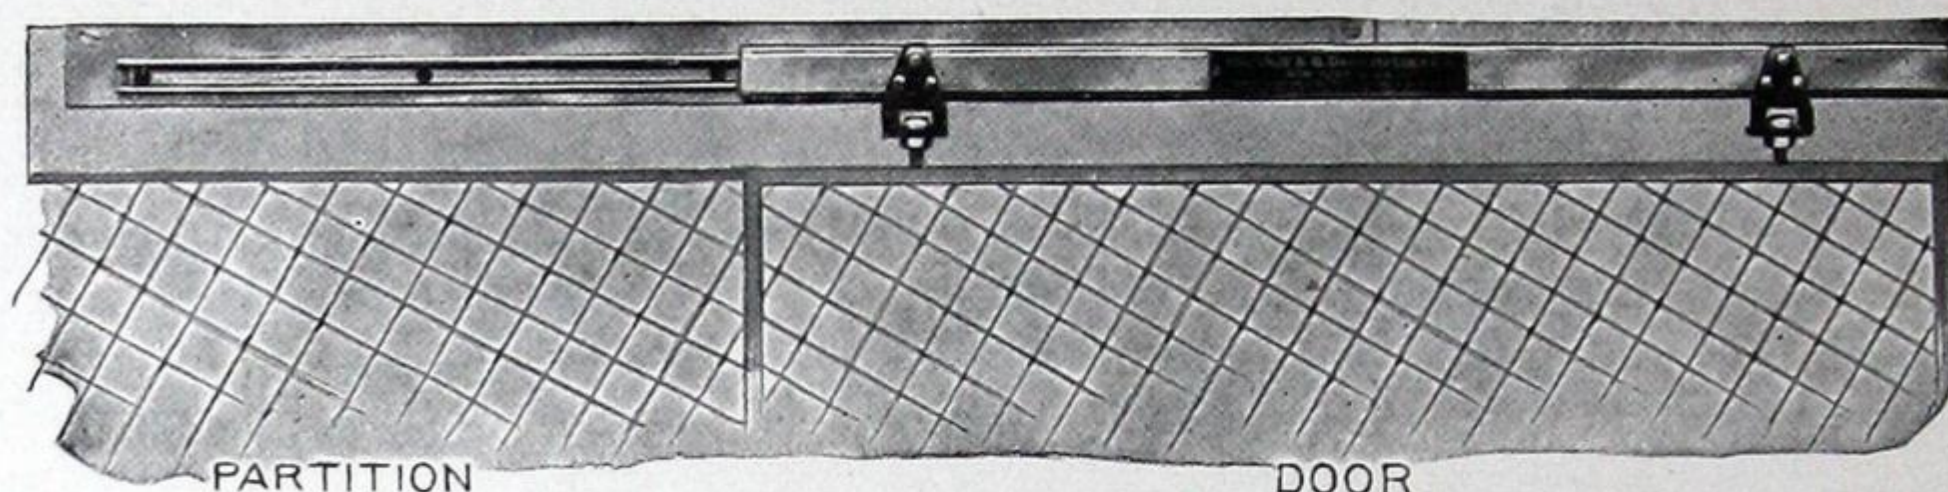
SHOWING SINGLE DOOR—CLOSED.
